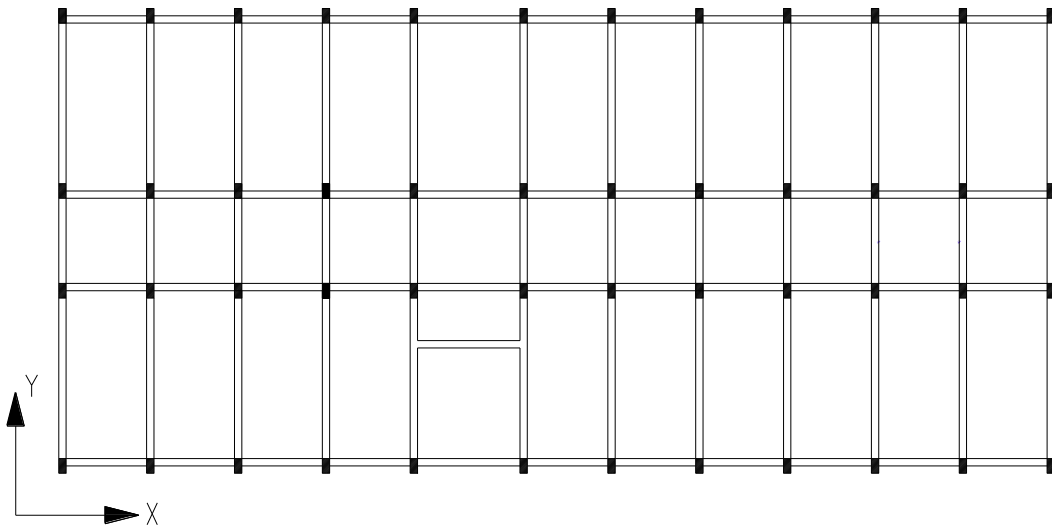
Plan View of the Designed Building with 0.0%-0.0% Shear Wall Ratio
